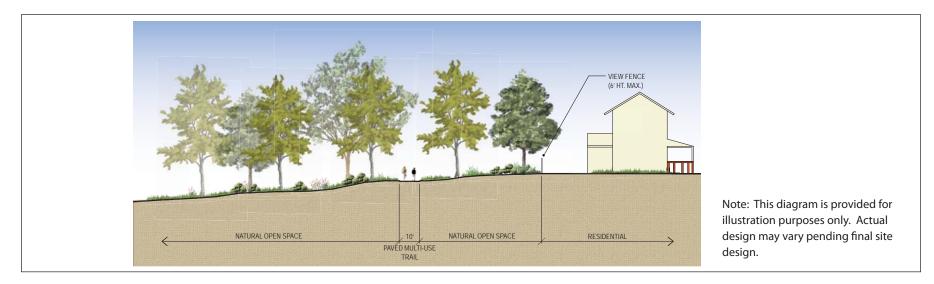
Conceptual Trail Cross Section - Open Space Trail (Typical)
